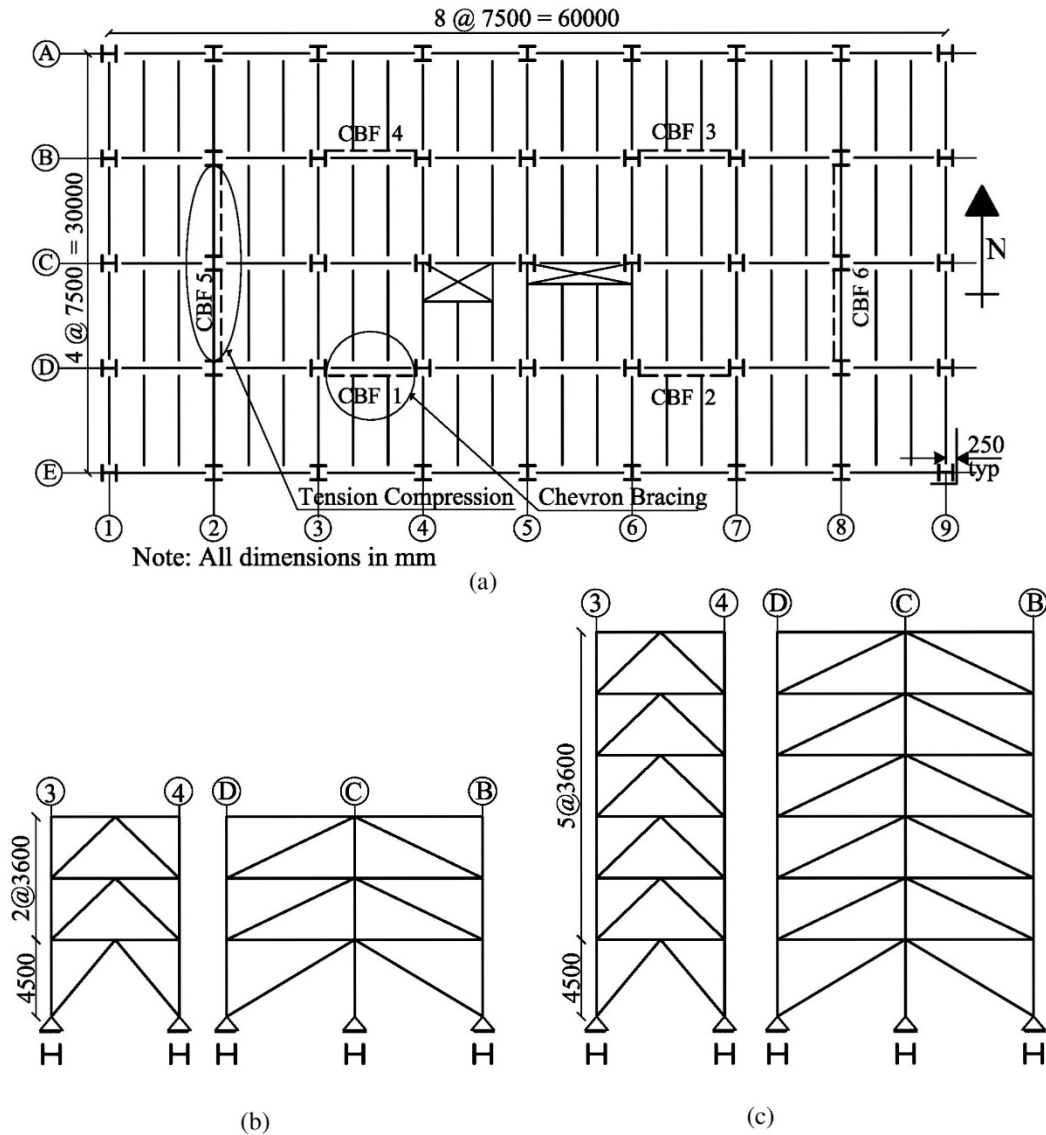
Studied buildings: (a) plan view; (b) E-W and N-S direction elevations for 3-storey building; (c) E-W and N-S direction elevations for 6-storey building.
